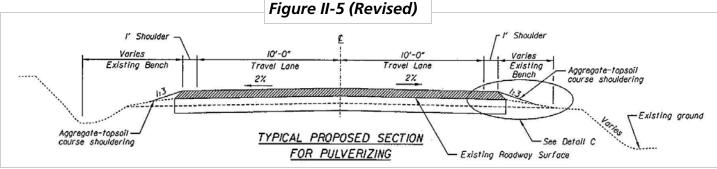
depicts proposed changes to the Yosemite Valley Loop Road. Travel lane and shoulder widths would be made consistent, where possible, to a standard width of 10 foot travel lanes and 1 foot shoulders. No trees would be removed to achieve these proposed standard travel lane and shoulder widths, nor would the existing road bench be widened to achieve these standard widths. In some locations, the existing roadway width could be made narrower.
